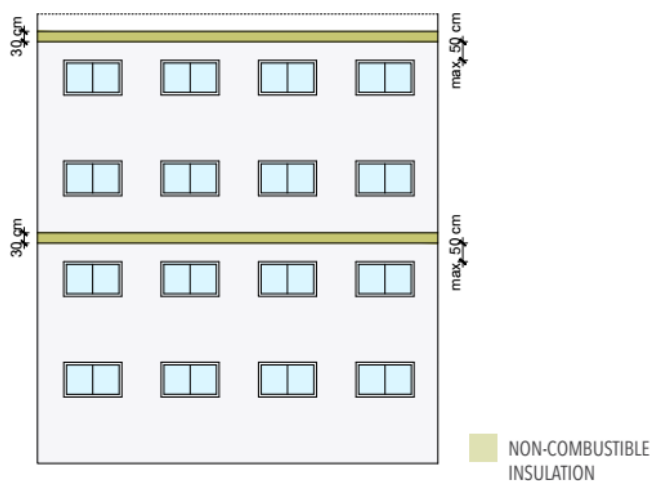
Prevention of the vertical fire spread by making a vertical fire barrier along the junction of the floor construction of each floor and external wall [17].
